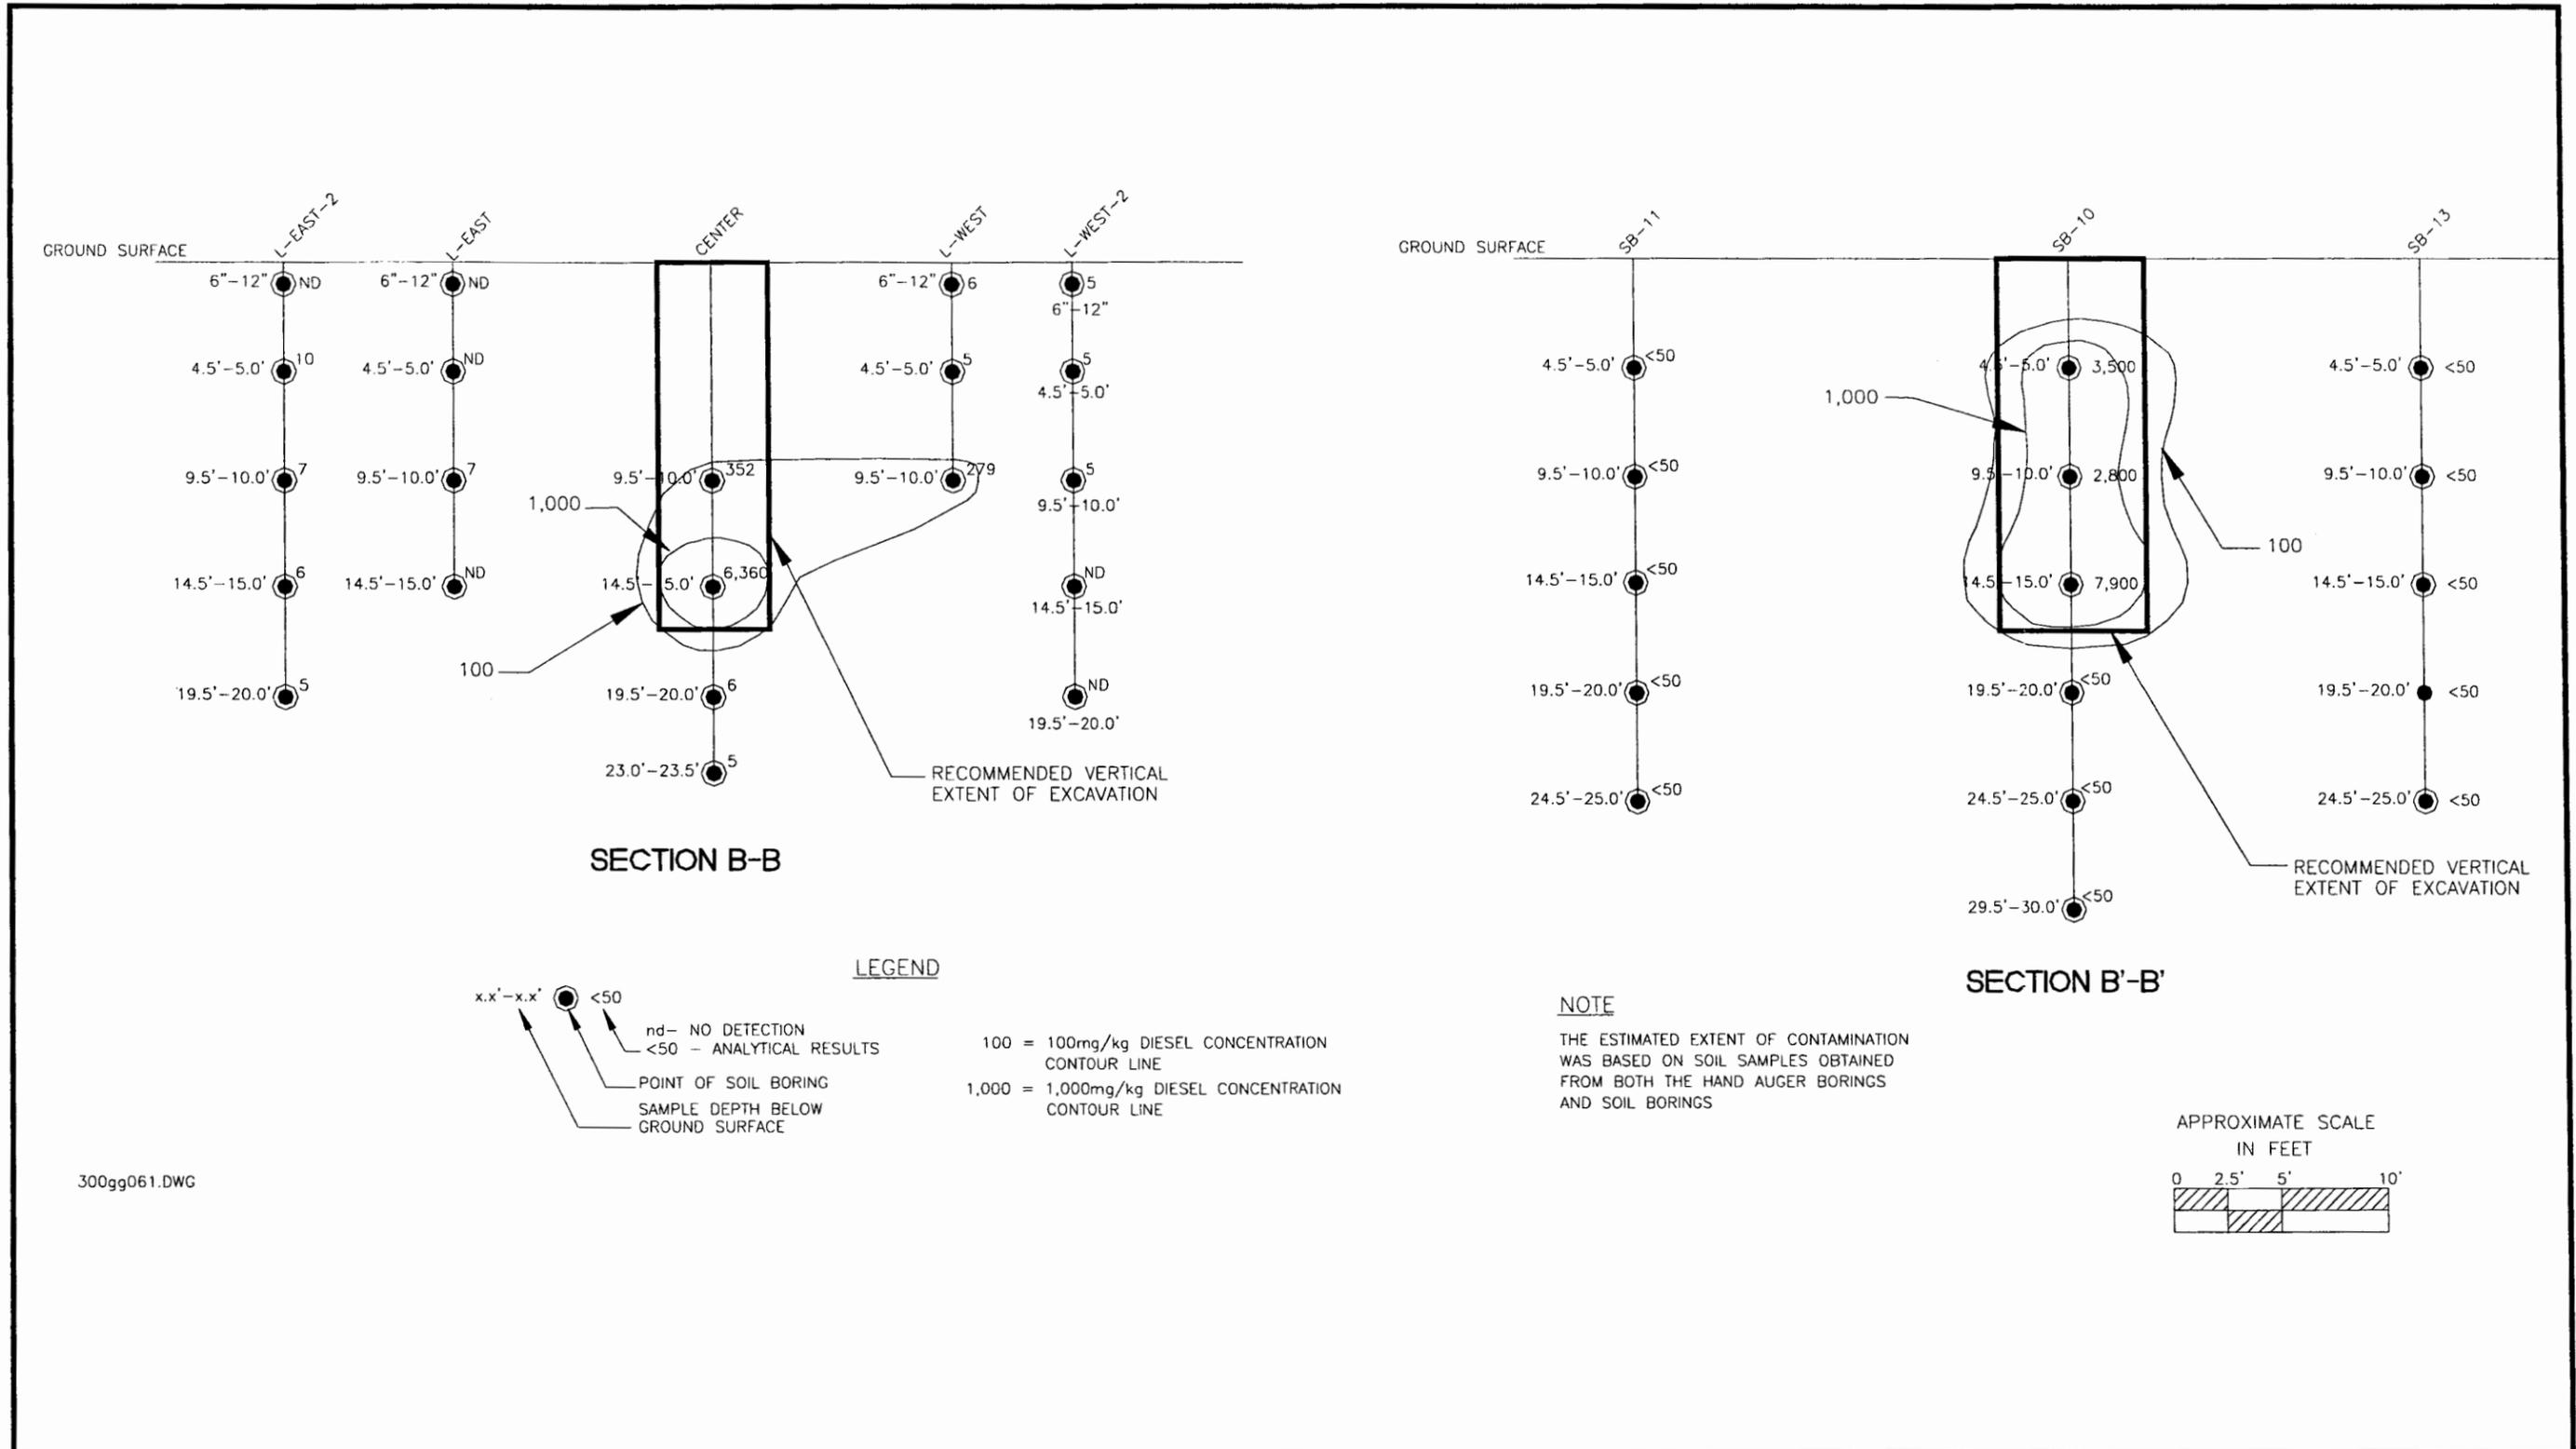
Recommended Vertical Extent of Excavation at Cross Sections B-B and B'-B'
